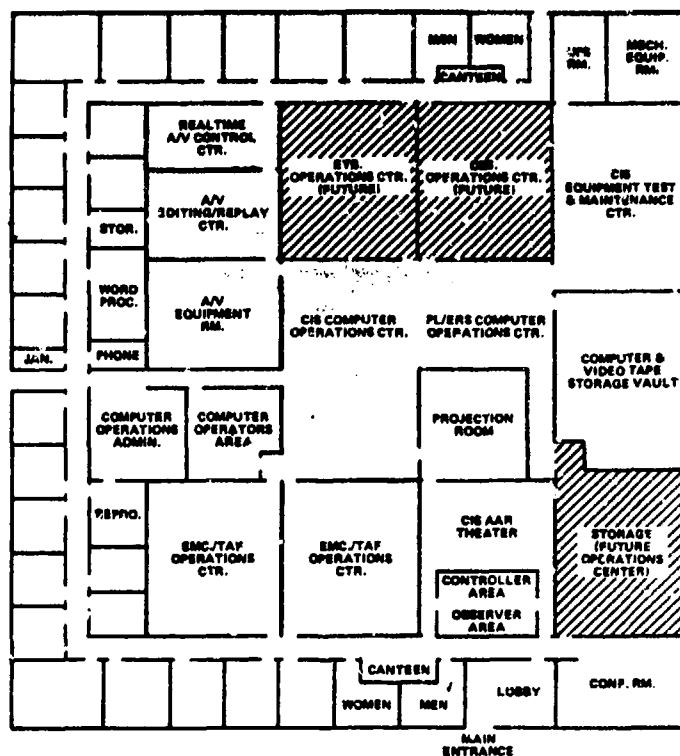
FLOOR PLAN CIS ENVIRONMENTAL PROTECTION SHELTER (EPS)
